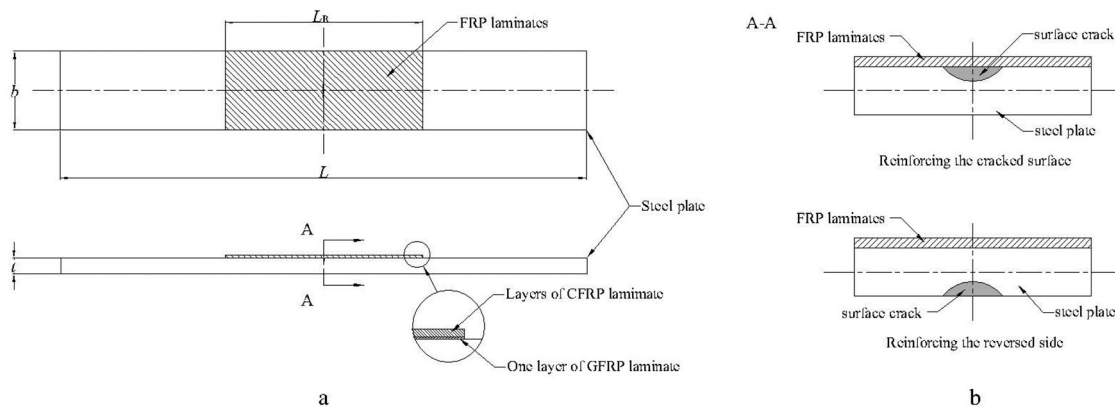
The configuration of specimens: a) a FRP reinforced steel plate; b) the location of a surface crack in a steel plate.
